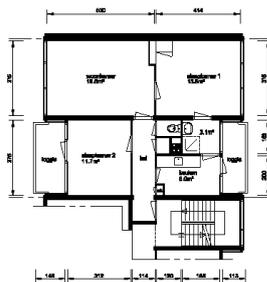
Floor plan of Intervam flats in Camera Obscuradreef (Mitros, 2009)
